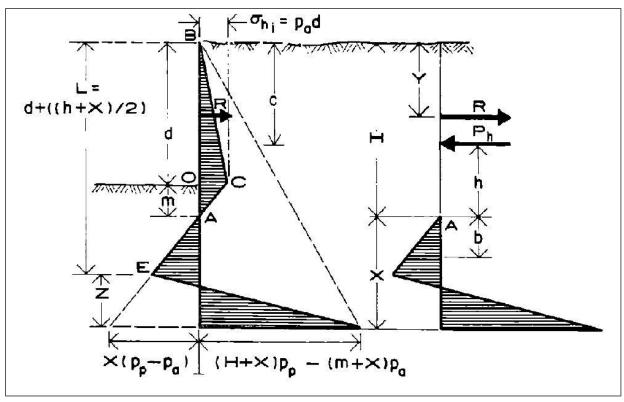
Backfill loading on soldier piles (Reference: Retaining Wall Design Guide, FHWA-FLP 94006)
